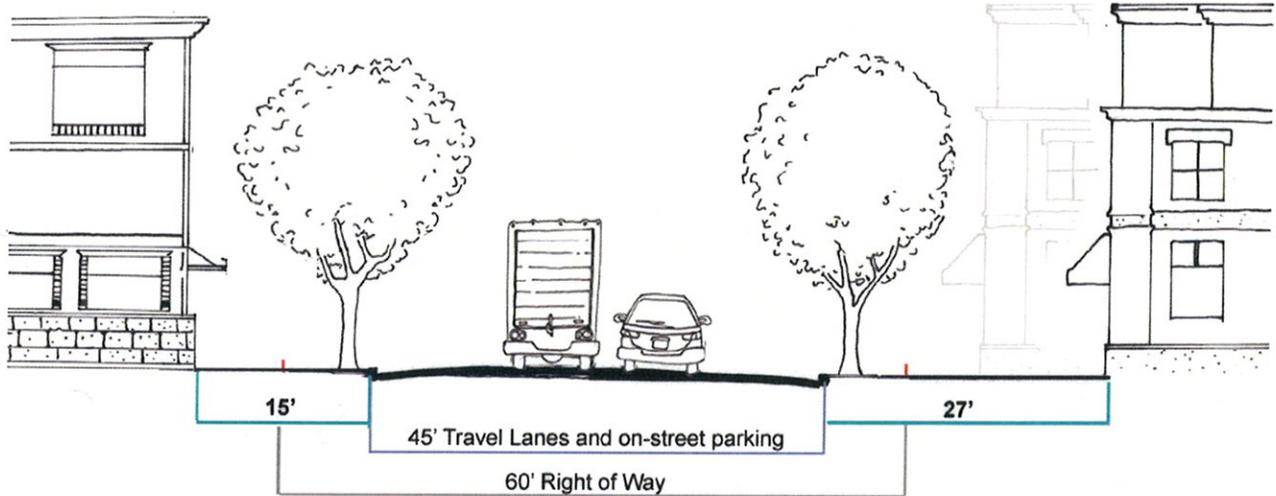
Lithia Way at Second St. Redevelopment under Existing Arterial Setback Requirements
